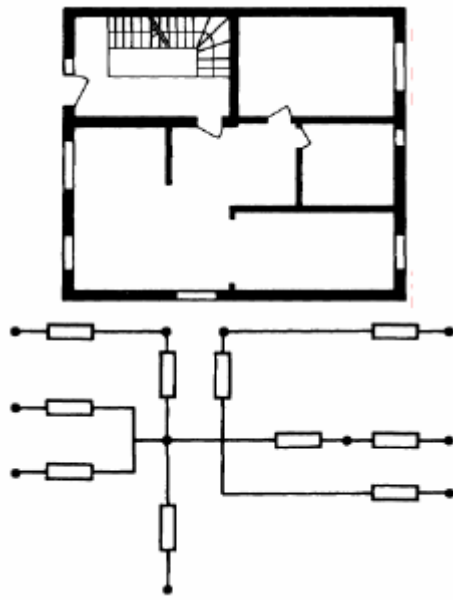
Floor plan of a building and its representation in a nodal network (Feustel, 1999)
